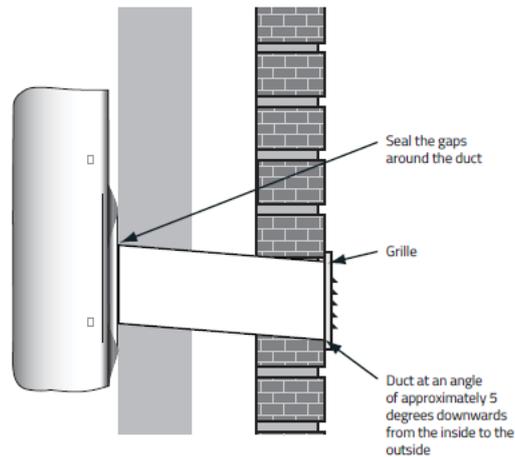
Titon Sonair requires a duct angled 5 degrees downwards to outside
